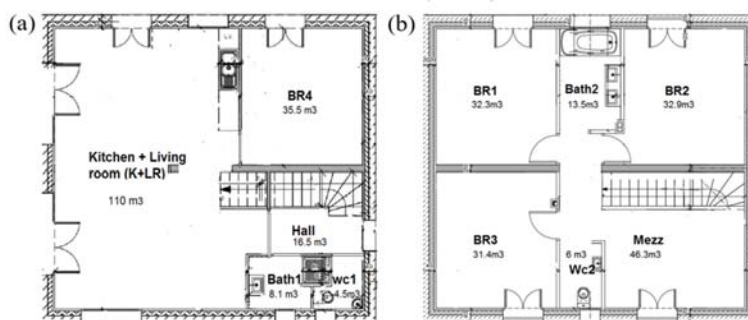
Single-family's house floor plant (a) first floor and (b) second floor, from Poirier et al. (2021)
